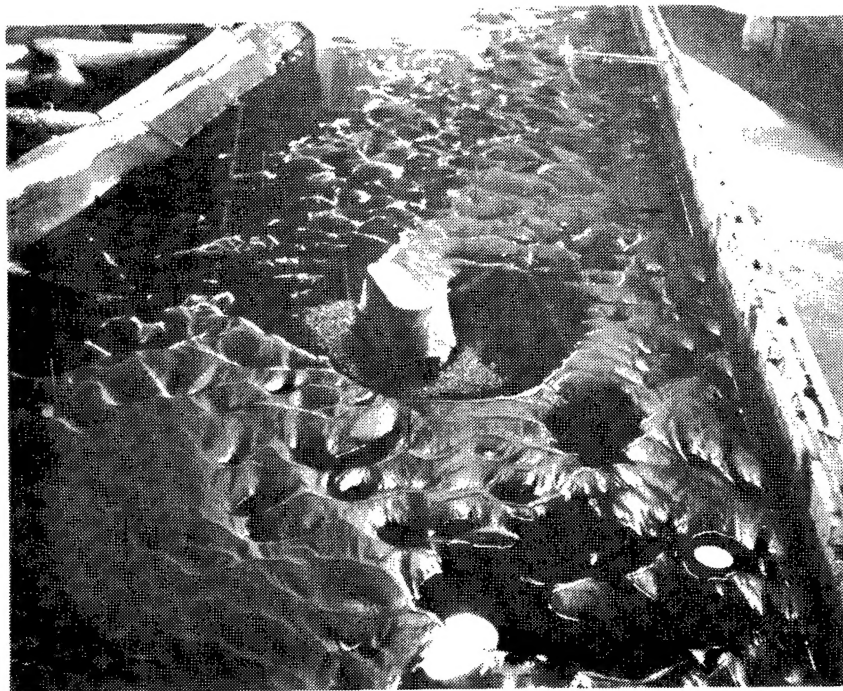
Run 25 looking downstream showing bed configuration at end of run. Bed armor placed at same elevation as Run 23 (Photo 4) but with velocity increased. Note deep scour on right with large bar behind pier. No failure of stone occurred.
